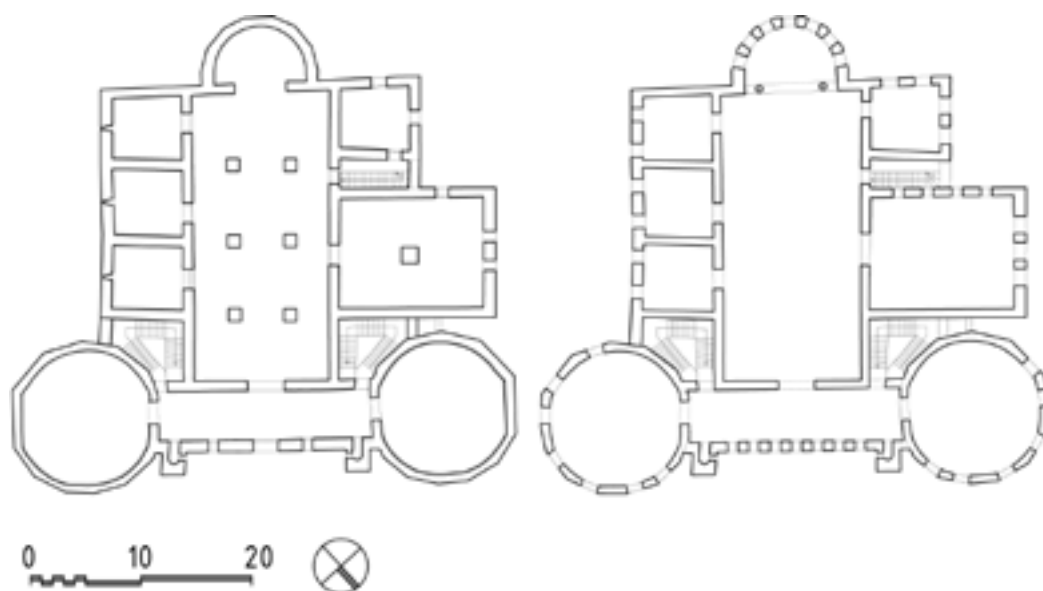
Ground and upper palace floor, proposed ideal reconstruction, Ž. Peković, 2010
